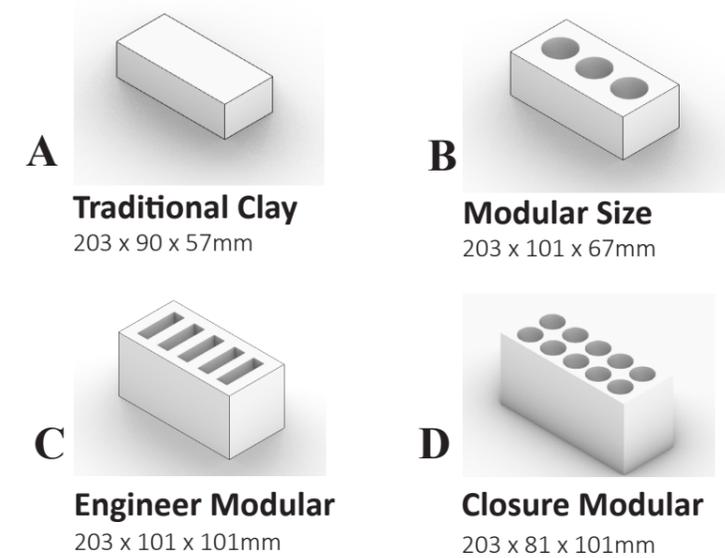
| Different brick modules developed in the construction field.
